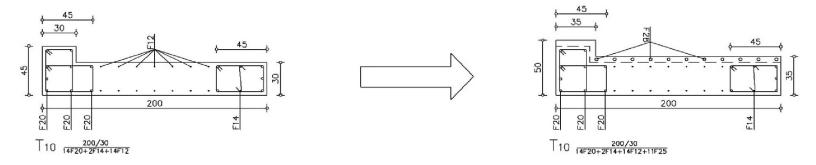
T10 Column Cross Section Area-Before and After the Strengthening
